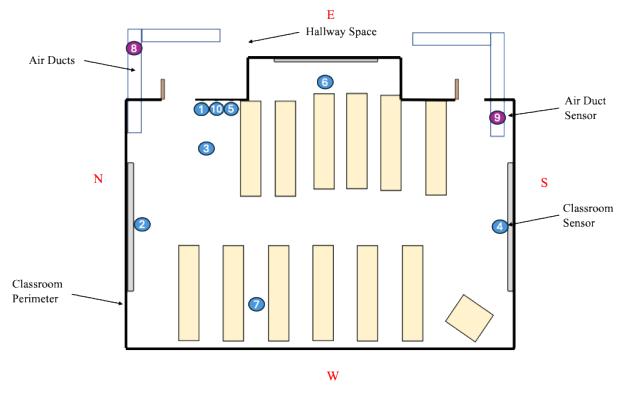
Top-down view of the classroom sensor placements are as follows: *Sensor 1* – East wall beside right door of classroom; *Sensor 2* – North wall of classroom; *Sensor 3* – Northeast ceiling mounted next to the supply air duct; *Sensor 4* – South wall of classroom; *Sensor 5* – East wall beside right door of classroom; *Sensor 6* – East ceiling of classroom; *Sensor 7* – West ceiling of classroom
